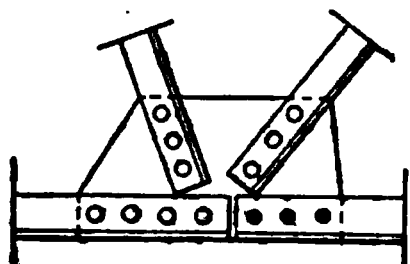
Detail of Joint E, Fink Truss, Fig. 7
